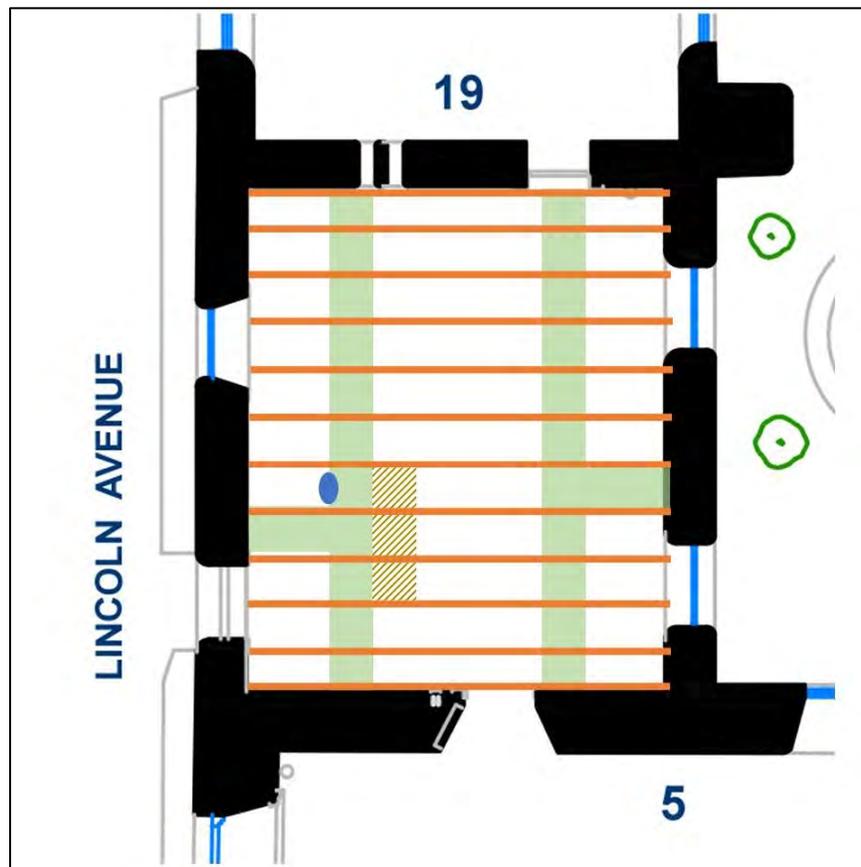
Schematic view of Room 6 subfloor features. Brown lines are the joists. Green shaded areas are the gas line trenches. The brown shaded area is the possible adobe wall or floor. The blue oval is the visible cobble that may be part of a wall foundation.
